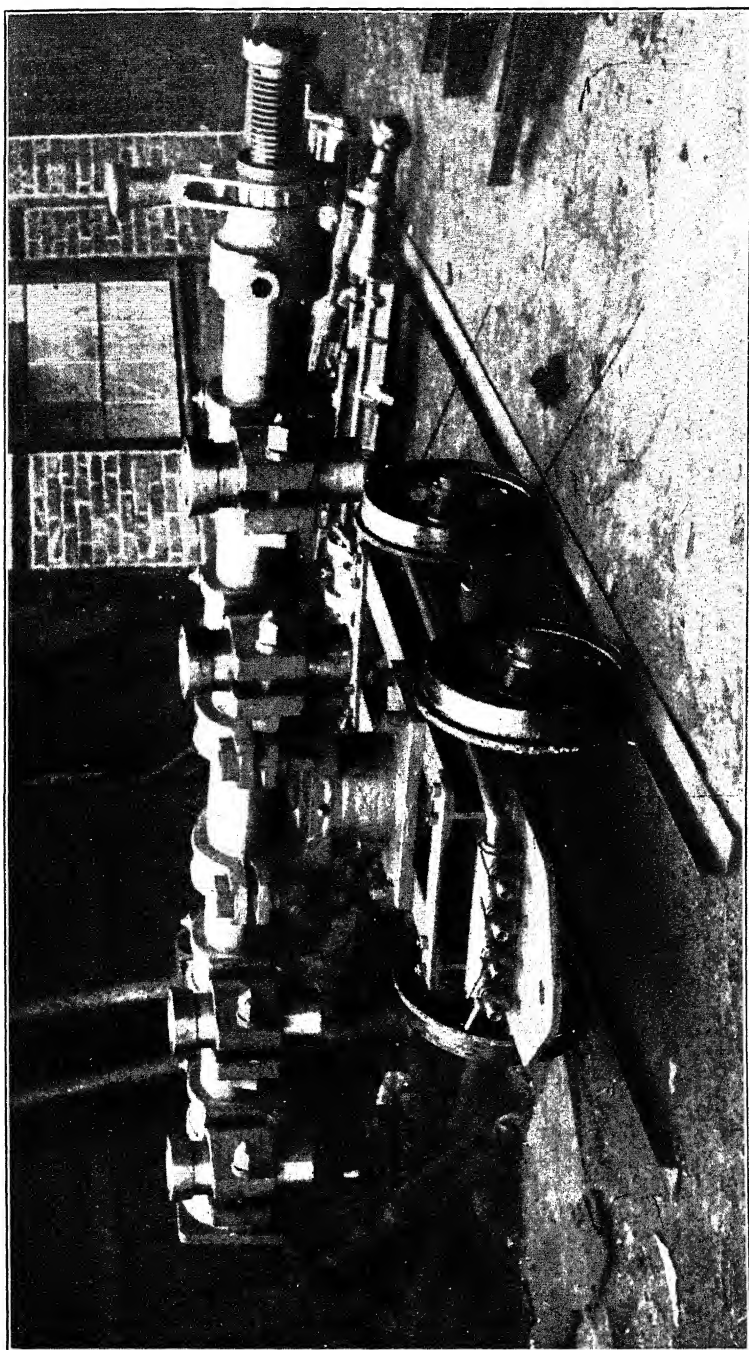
TUNNEL-CAR FOR CARRYING FOUR DRILLS; NOW IN USE IN THE LOETSCHBERG TUNNEL.
